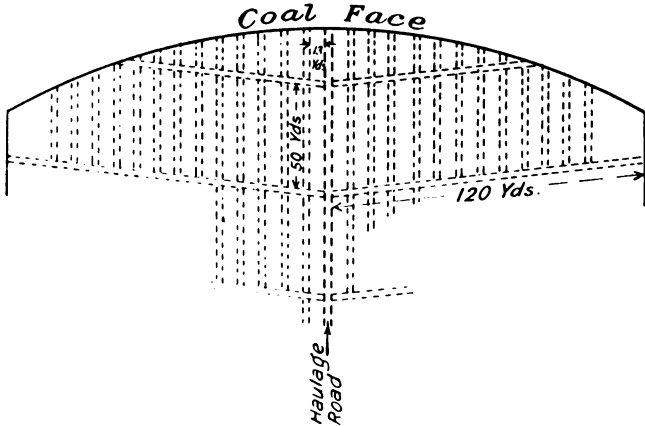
Plan of Long-wall Workings in a Welsh Colliery.
